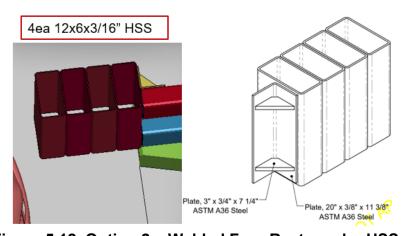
Option 2 – Welded Four Rectangular HSSs
